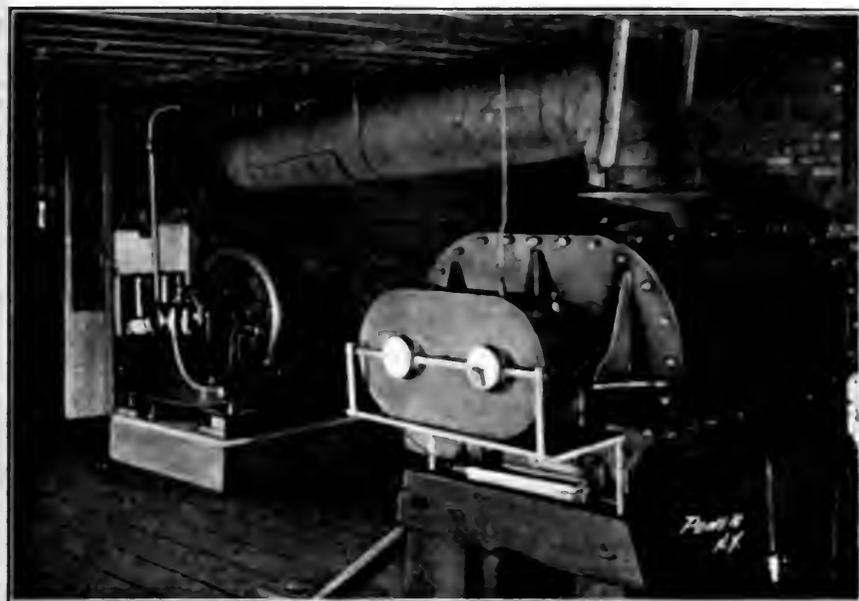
ROSS BLOWER BELTED TO MOTOR
